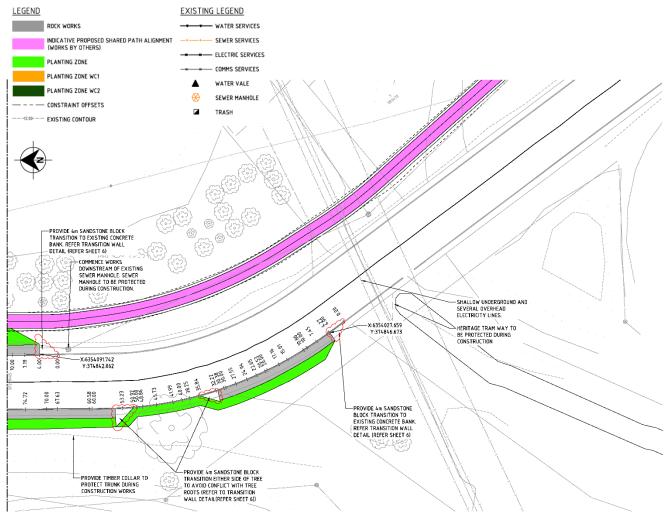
Winding Creek South of Myall Road, Cardiff: Site Overview (2 of 2)
